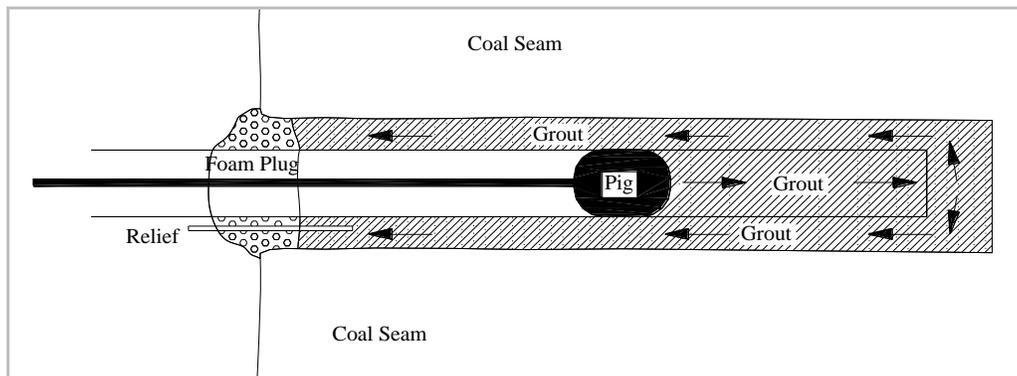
Recommended Standpipe Grouting Techniques (Pigging Method)
